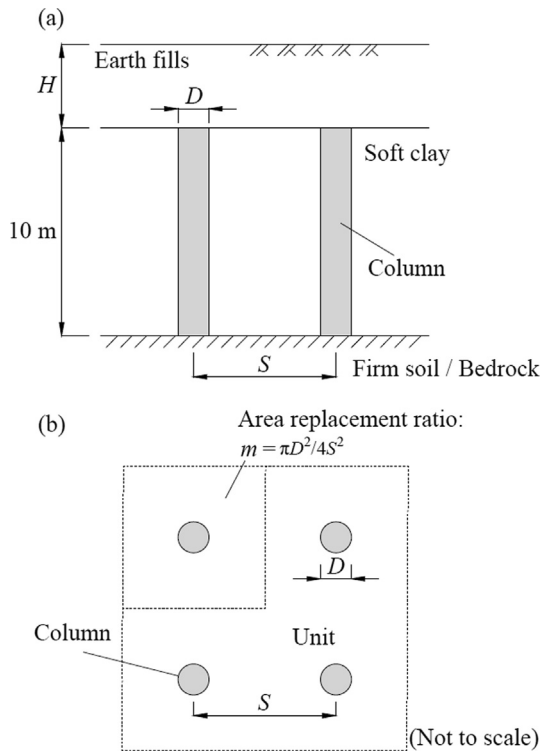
Schematics of composite ground with four columns: (a) elevation view and (b) plan view.
